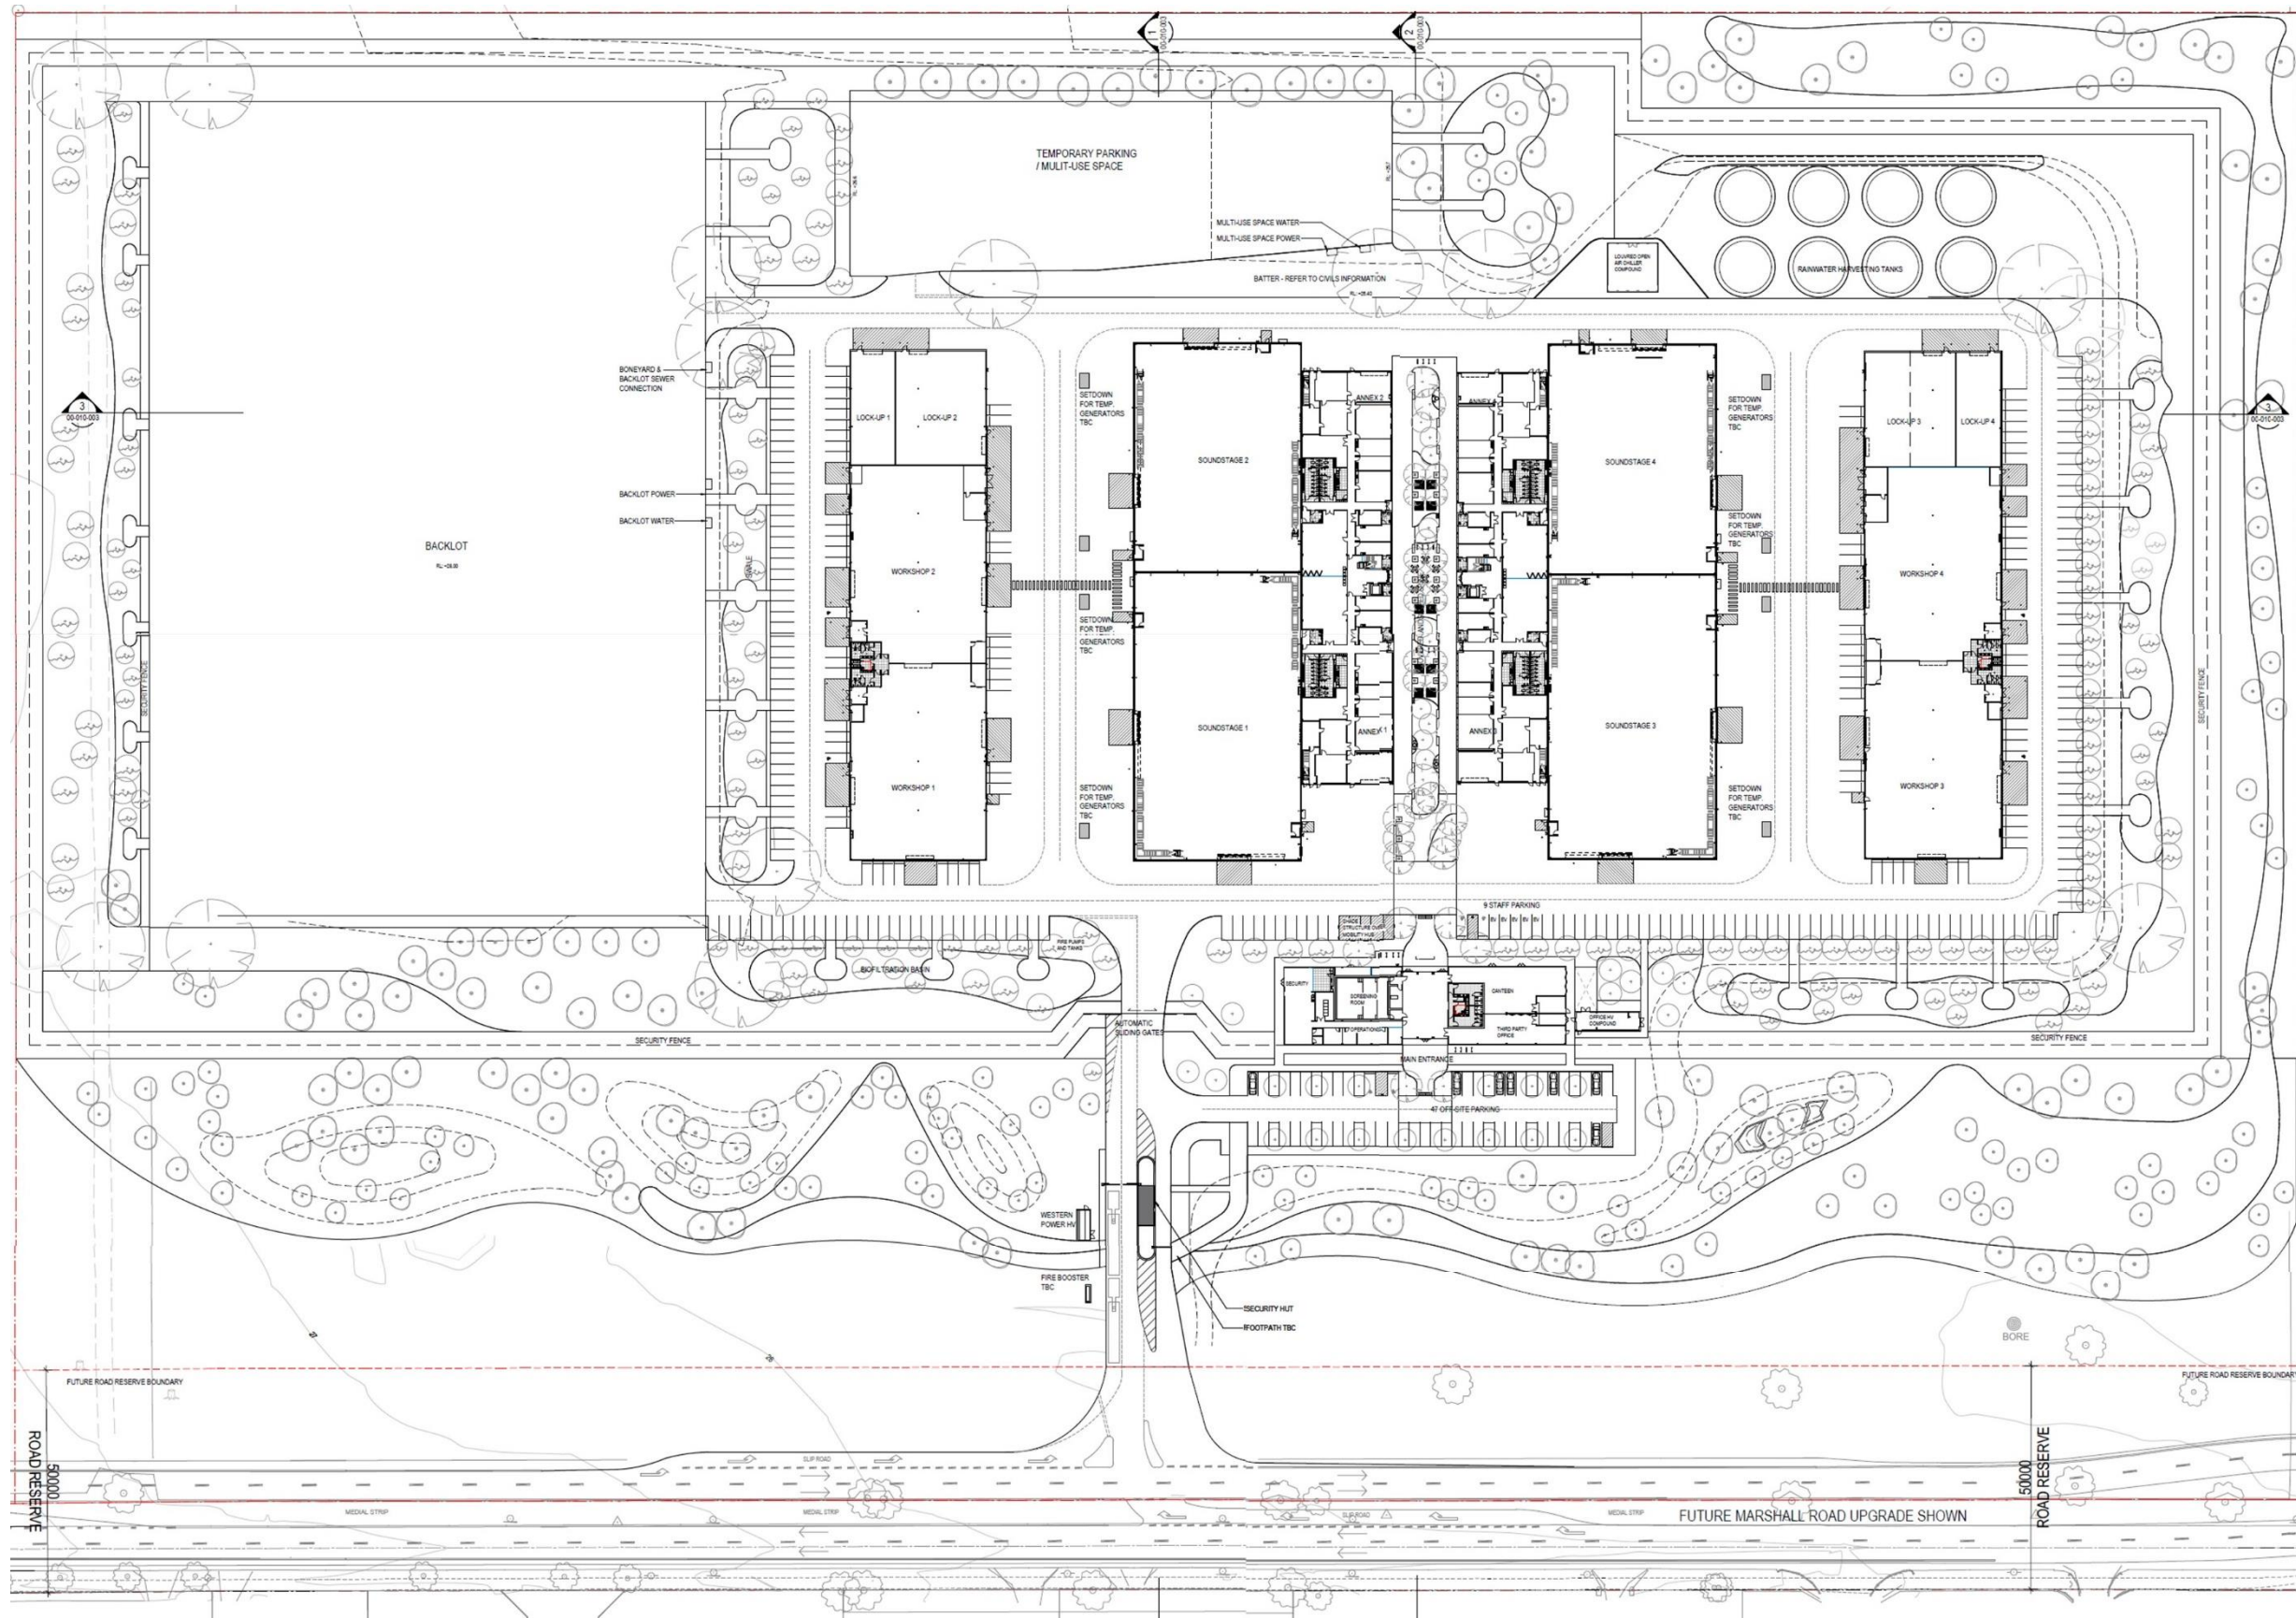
Malaga Site development plan (source: Hassell, March 2023)
